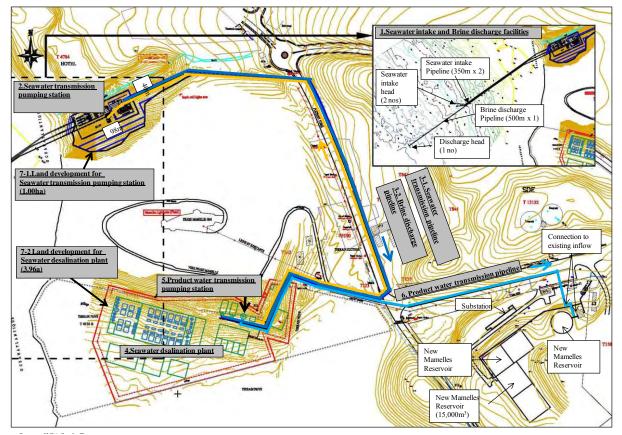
shows the general layout plan of the construction site of the seawater desalination plant.
